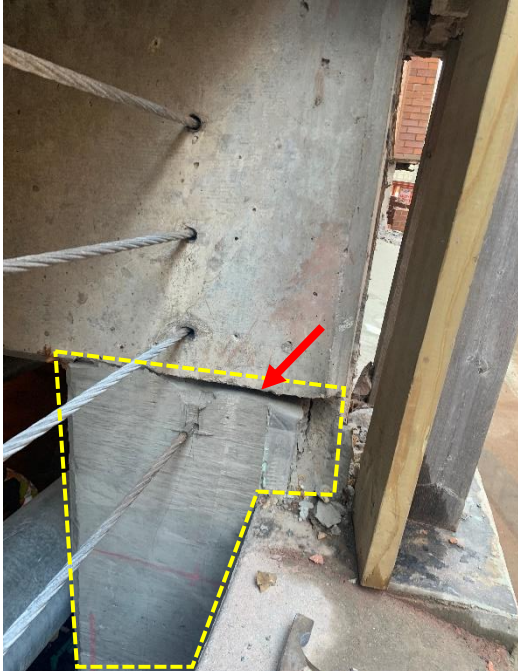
Previous concrete repair at Column 11A below beam at the north face of the column. 4-inch deep cold joint between the concrete repair and the bottom face of the column indicated with red arrow.
